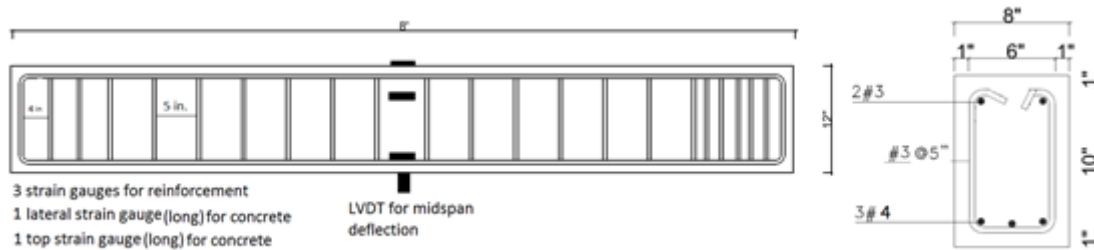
Reinforcement layout and location of strain gauge for test beams
